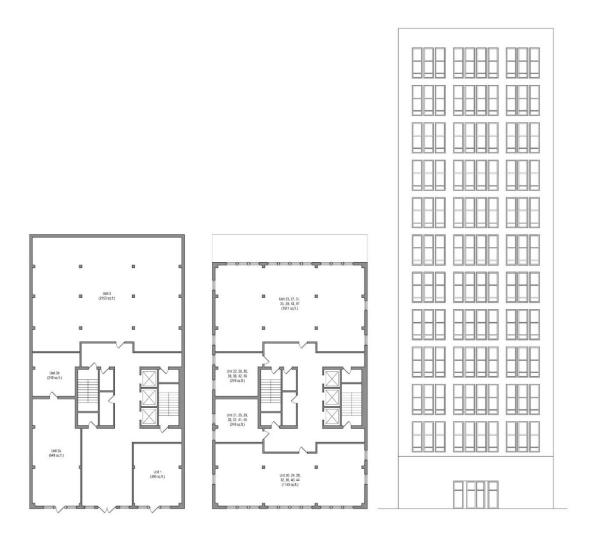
, 288, 289 (left to right): Building 10, first (ground) floor (1921); floors 6–12 (1921); street-front elevation (1979). 1" = 32'. For plans, north is up.
